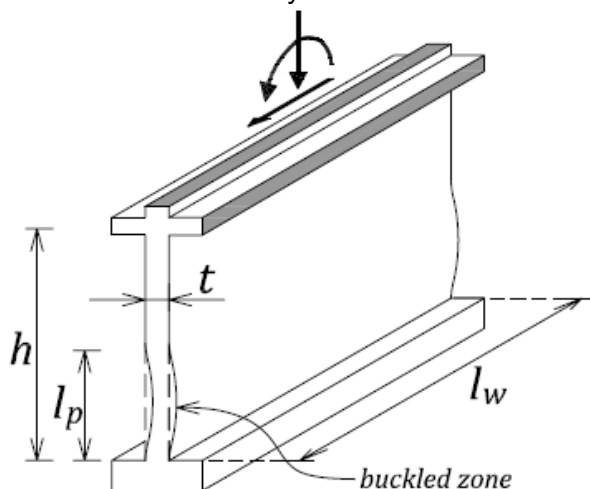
Out-of-plane instability in a shear wall subjected to in-plane loads (adapted from Paulay and Priestley, 1993, reproduced by permission of the American Concrete Institute).
